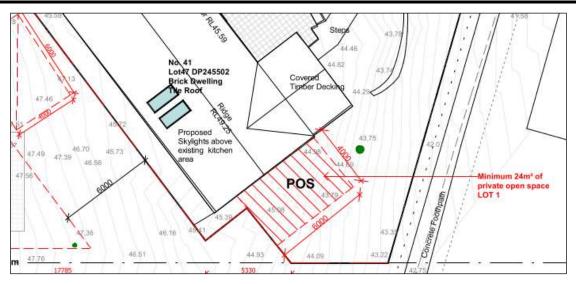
Nominated POS to Existing Dwelling on Subject Property
